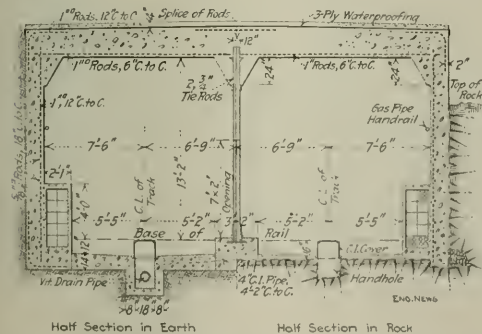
REINFORCED-CONCRETE SUBWAY ON LEXINGTON AVE.
